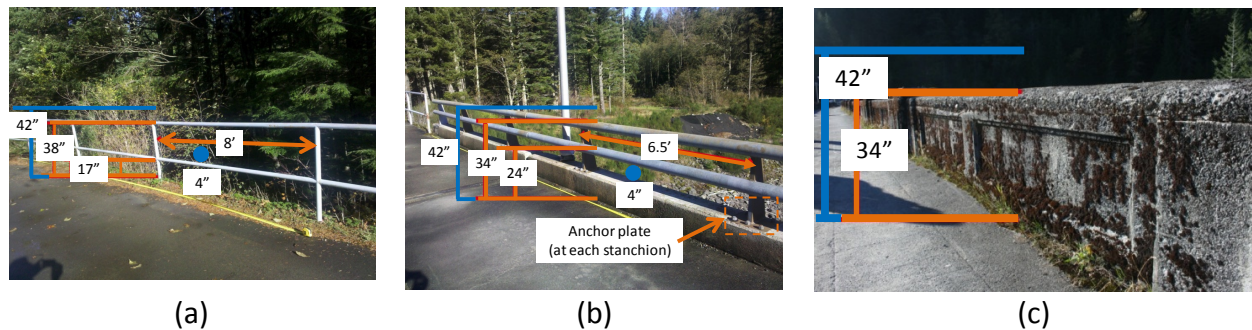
Existing (in orange) and required (in blue) geometry of safety features in: (a) Section 1 (guardrail), (b) Section 2 (vehicle barrier) and (c) Section 3 (concrete parapet)
